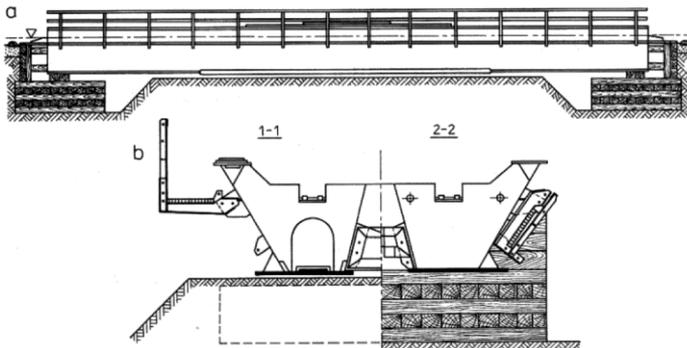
Bridge-type stress-relieving structure; box span of the twin-beam system, type KO-30/75 (Miklin & Sawicki, 1993): a - longitudinal view, b - cross-section, 1-1 cross-section in the span with folded pavement, 2-2 cross-section at the support with folded pavement
